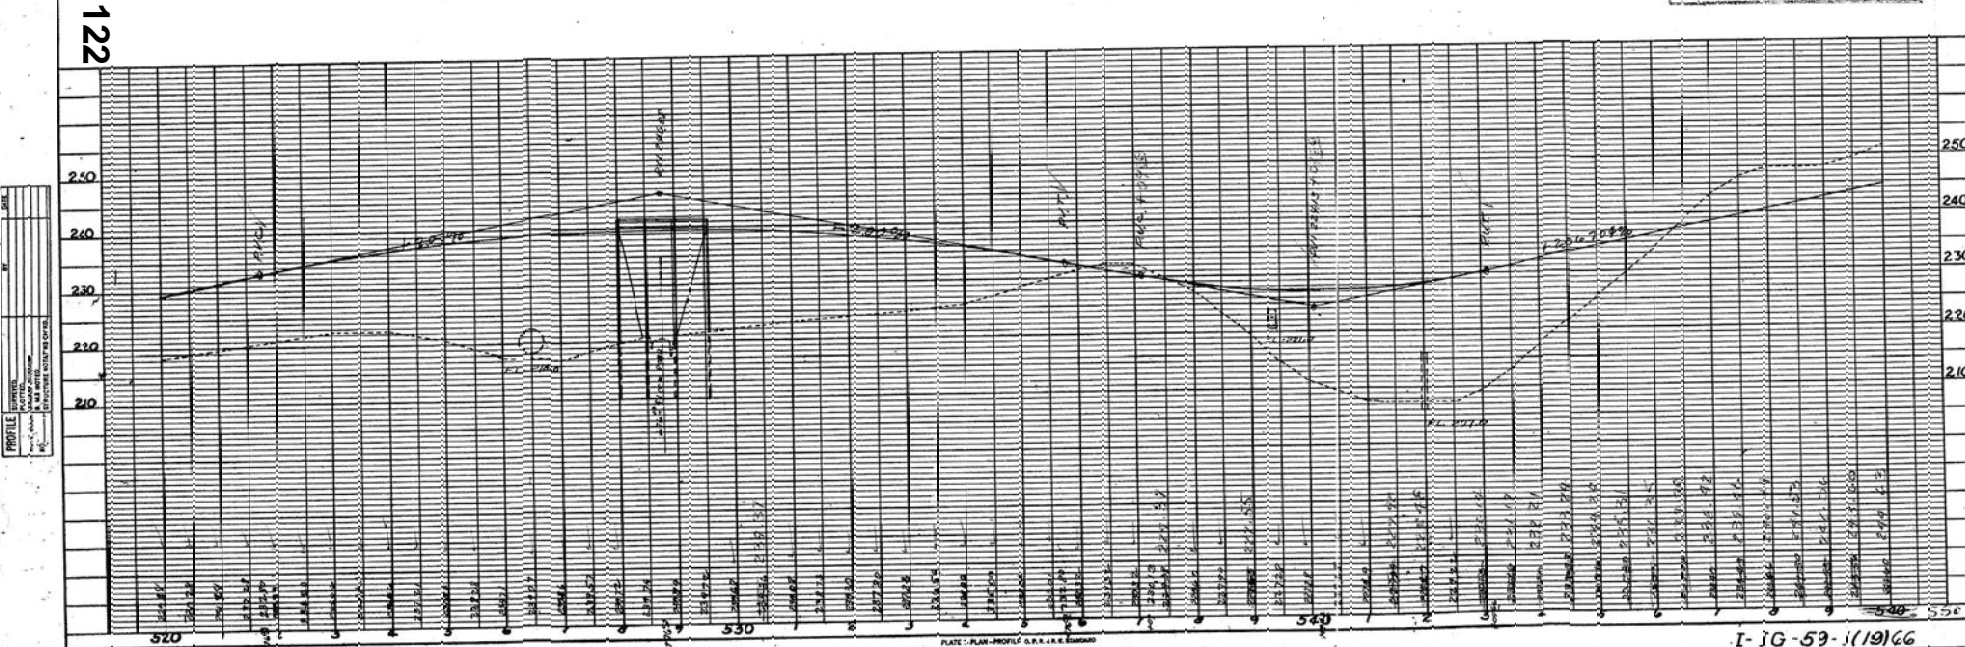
PLATE - PLAN-PROFILE G. B. & A. R. K. ENGINEERS
